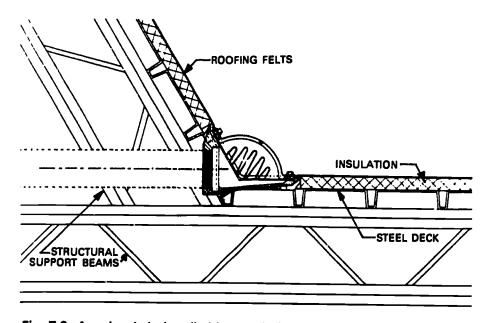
A series drain installed in a typical overhanging balcony or cornice
